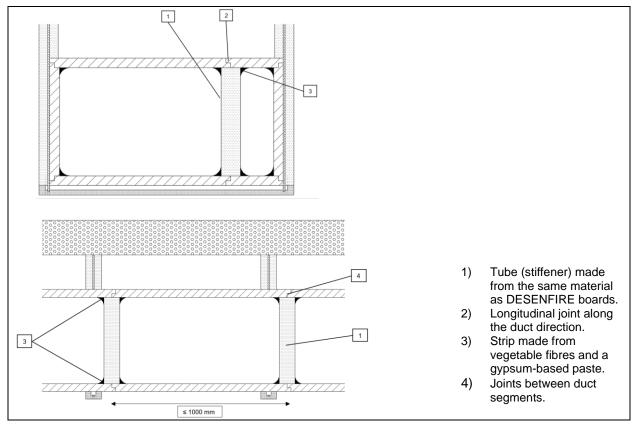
Stiffener viewed in a duct cross-section (image above) and in a duct longitudinal section (image below).
